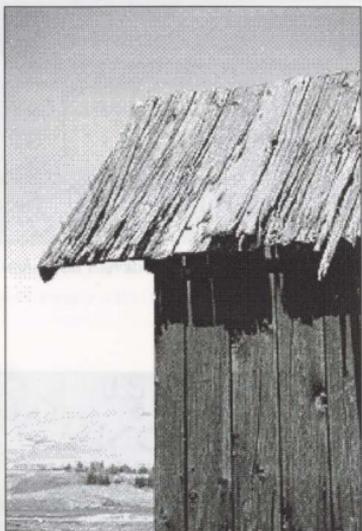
Chicken Coop, Detail of Roof at the Southwest Corner.
